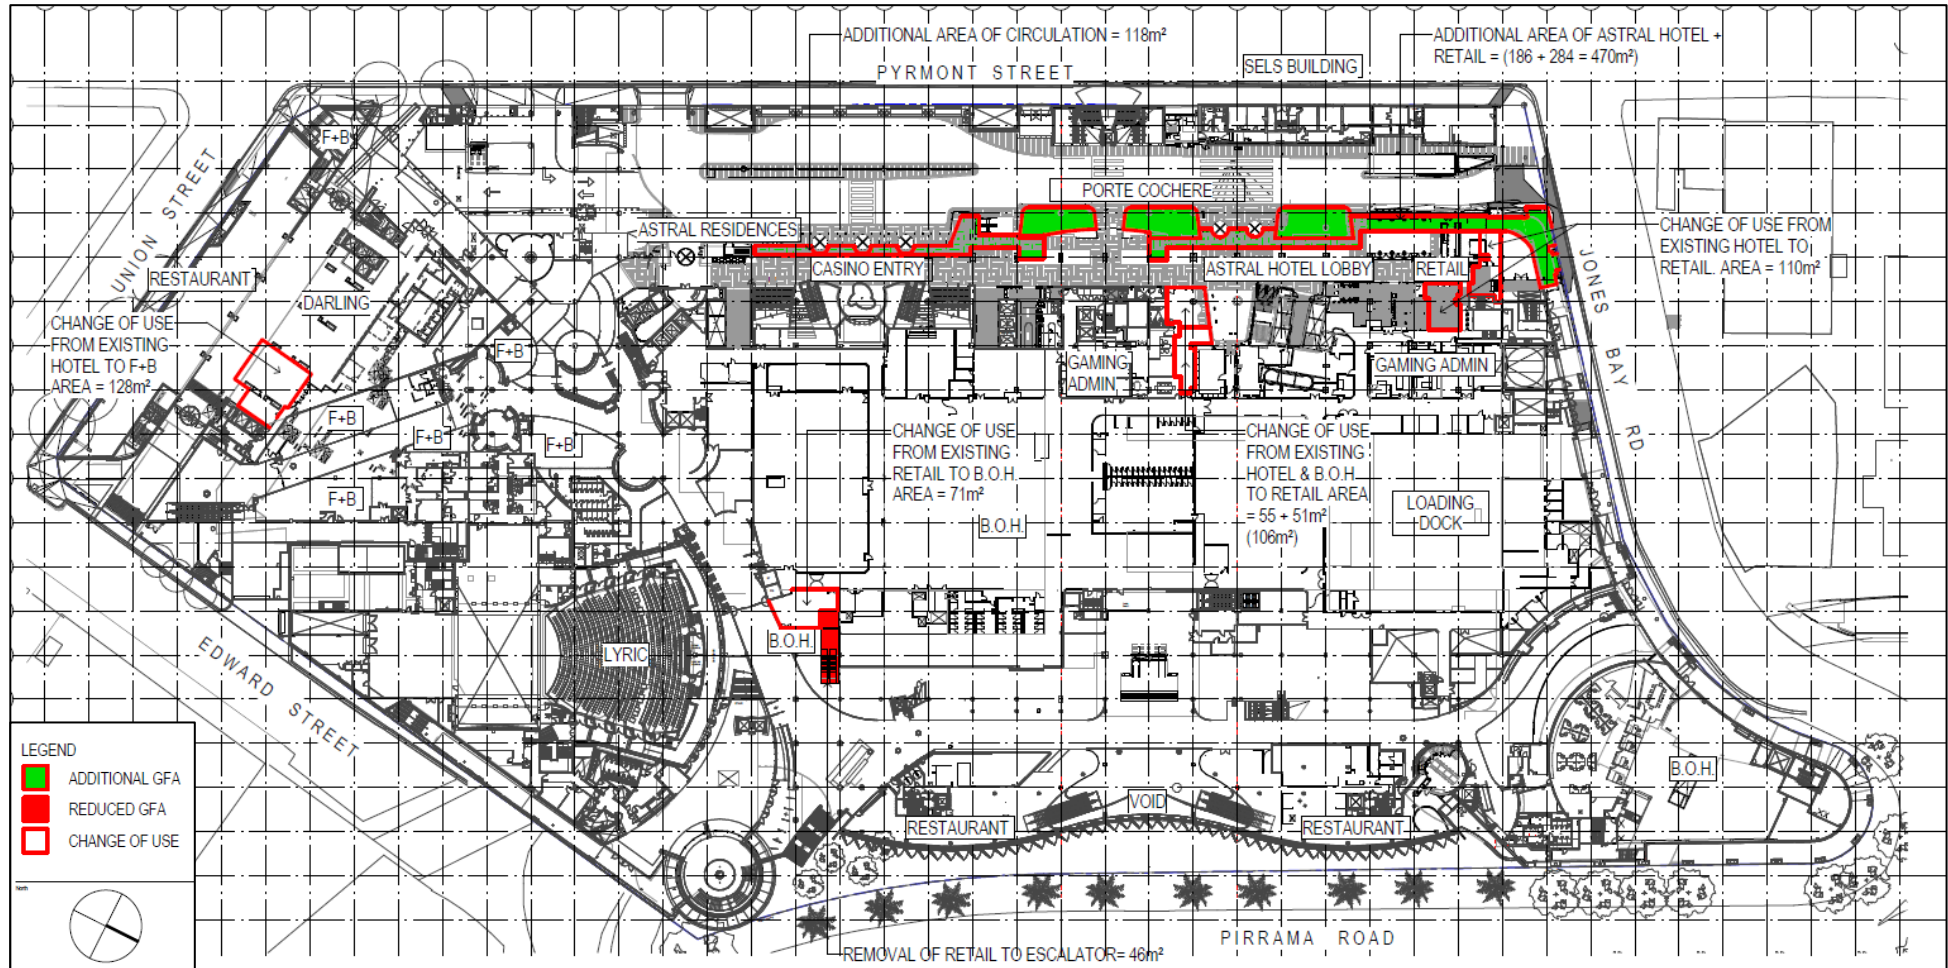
Proposed additional floor area (in green) on the ground floor as a result of an extension to the glass frontage to the porte cochere (Source: Proponent's EA)
